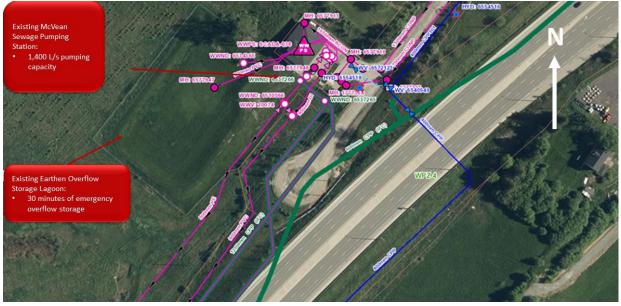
Existing Linear Utilities Surrounding the McVean SPS, Located on Ebenezer Road
